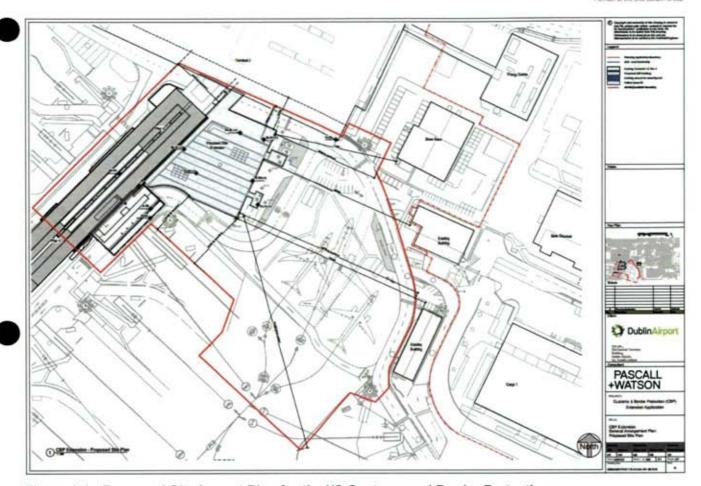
Proposed Site Layout Plan for the US Customs and Border Protection
